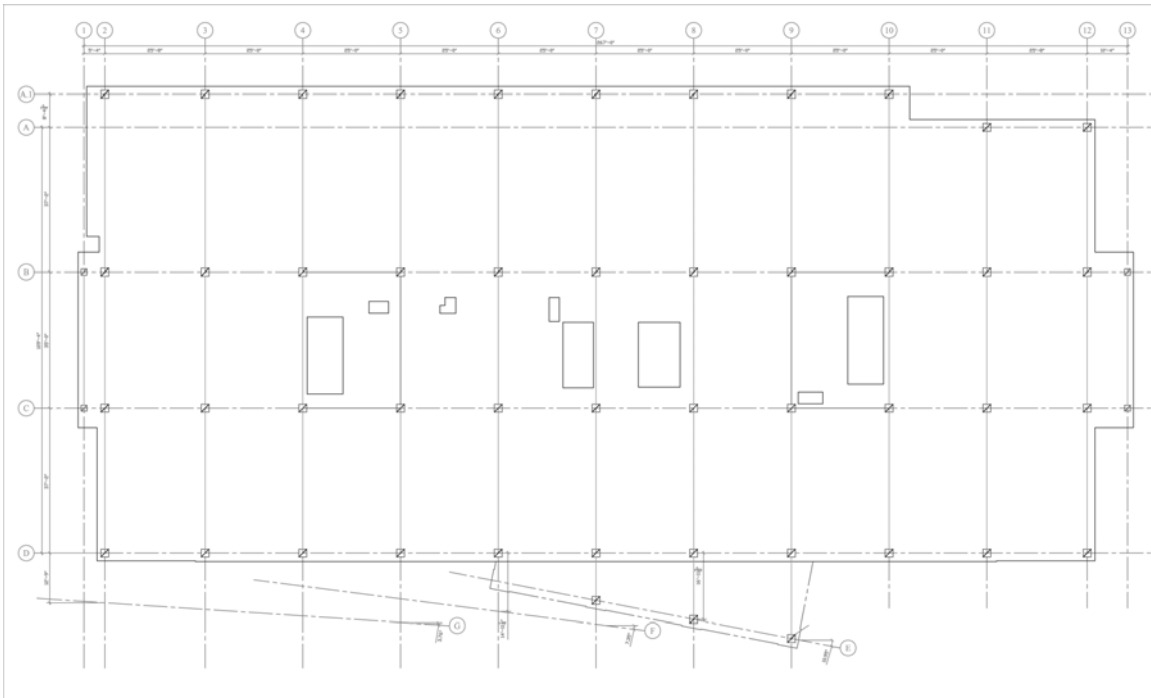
2<sup>nd</sup> Floor plan – concrete
